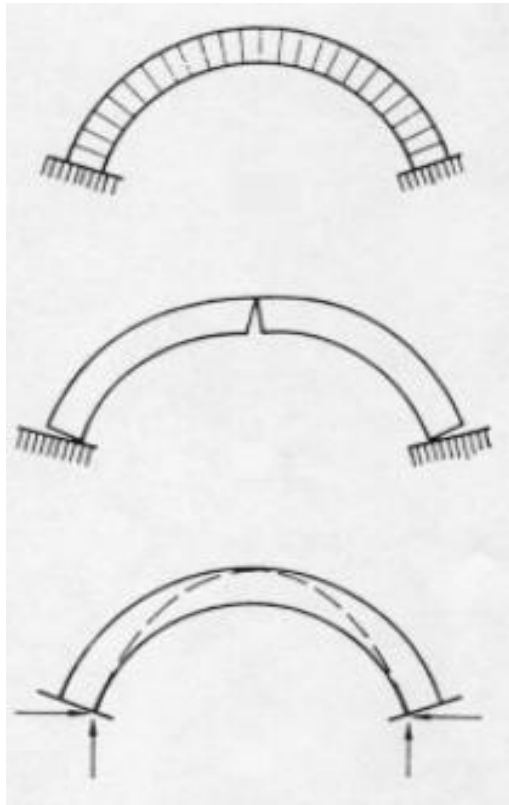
Crack formation in a masonry arch after striking the centering. Source: [2].
